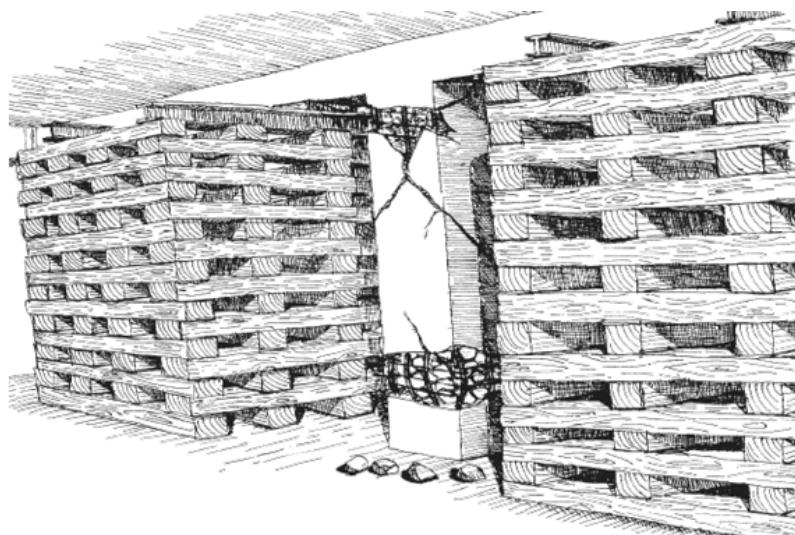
Strong propping using railway timber beams either side of a damaged column (EPPO, 2000)
